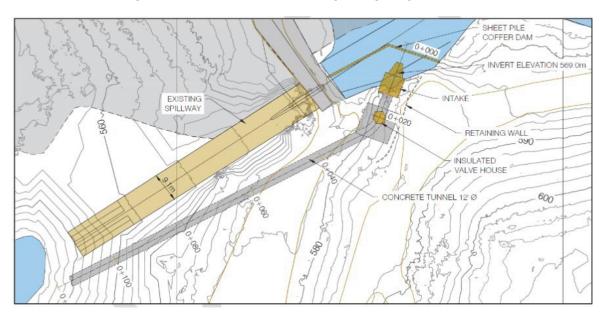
A-2: Wareham Dam Spillway Project Tunnel
